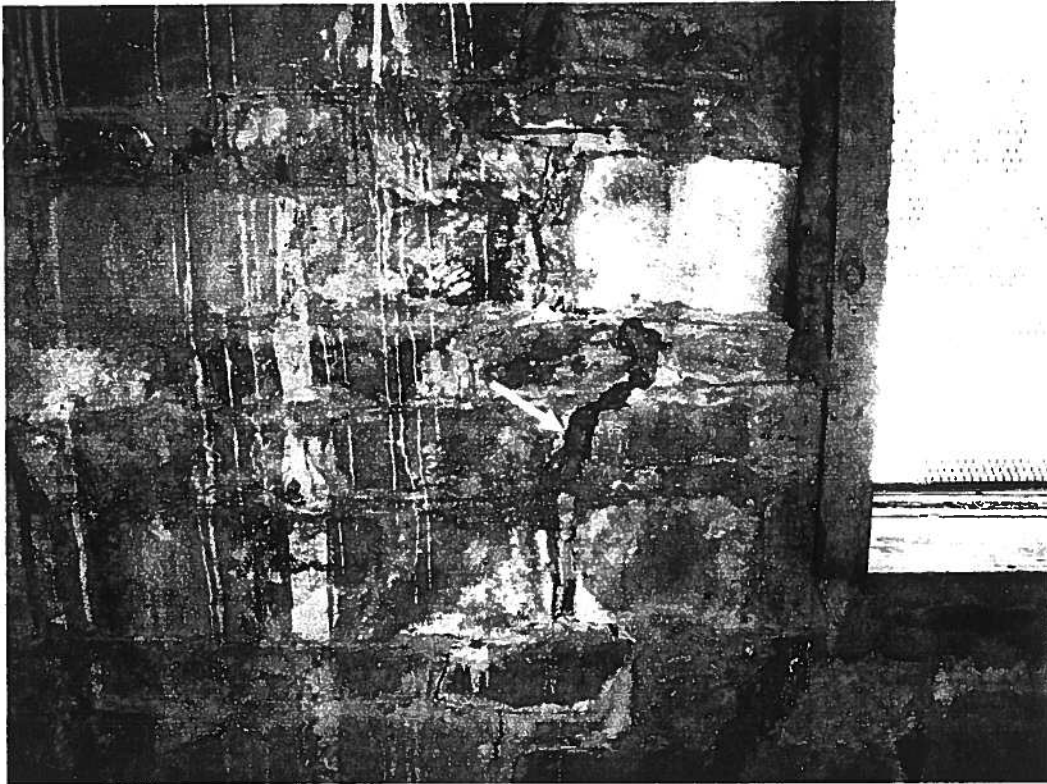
Wall cracking on the northeast side of the building [5/22/03].
